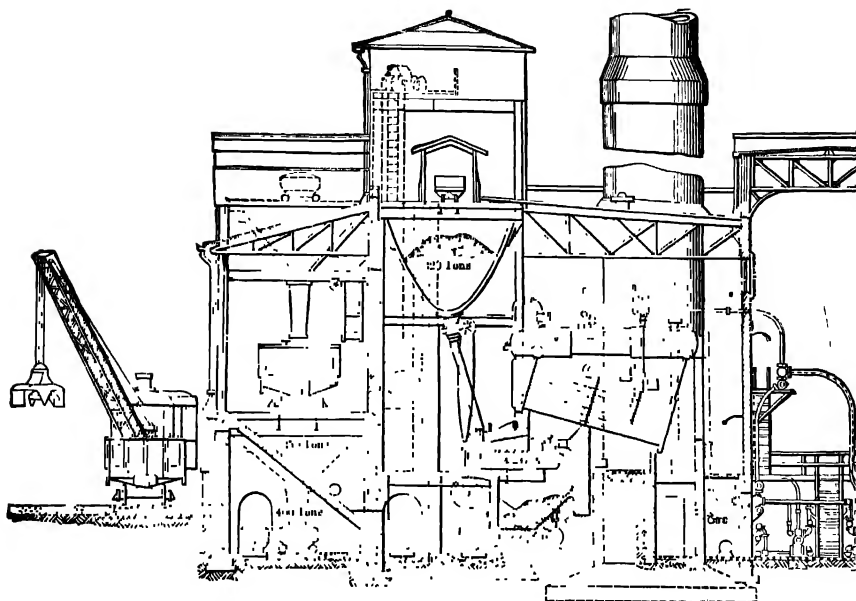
Typical Installation — Portable Crane. (Grab Bucket and Bucket Conveyor.
